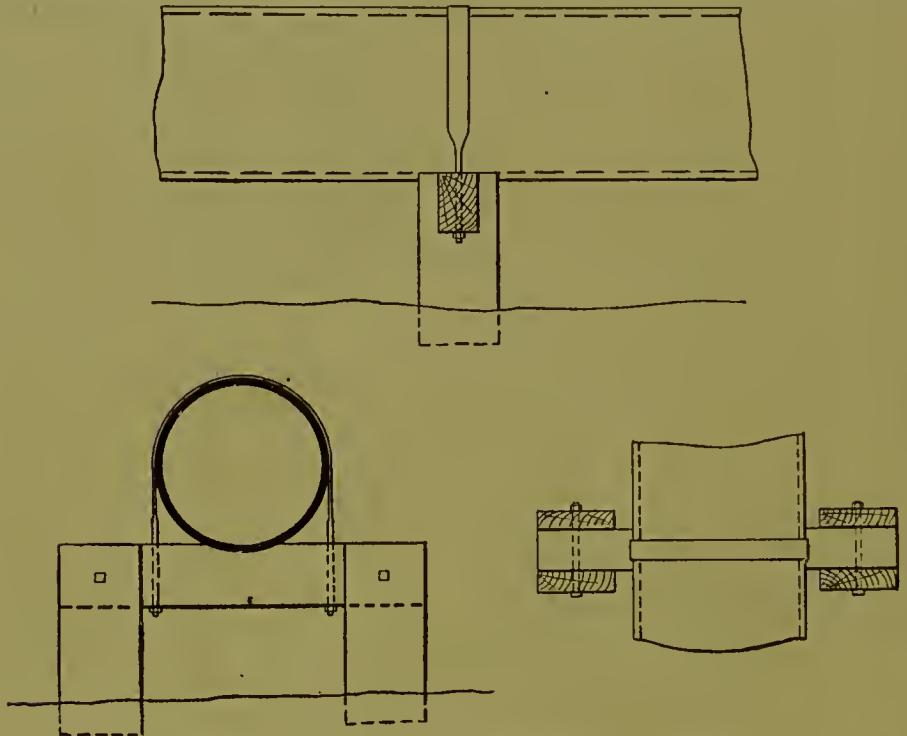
Cast Iron or Steel Pipe on Piles.
